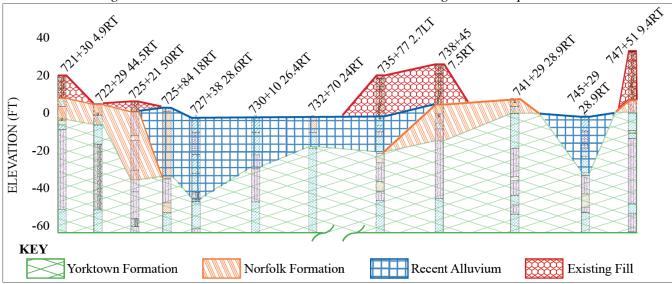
Variable Yorktown Elevations in I-64 EB Bridge over Hampton River
